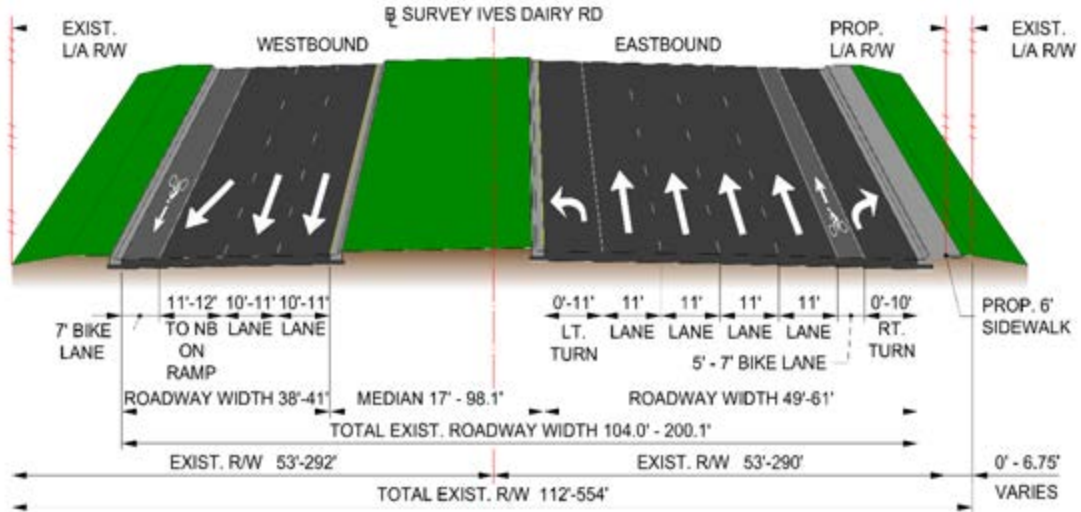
15: Proposed Typical Section - Alternative 3 – CR 854/Ives Dairy Road
